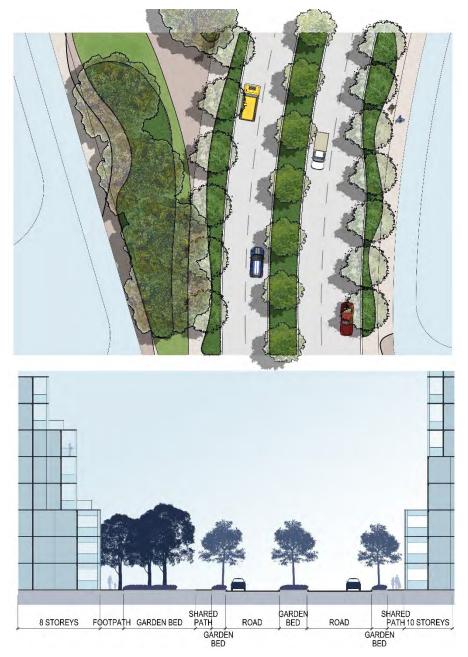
Resolution Drive (Plan Extract and Indicative Section)
